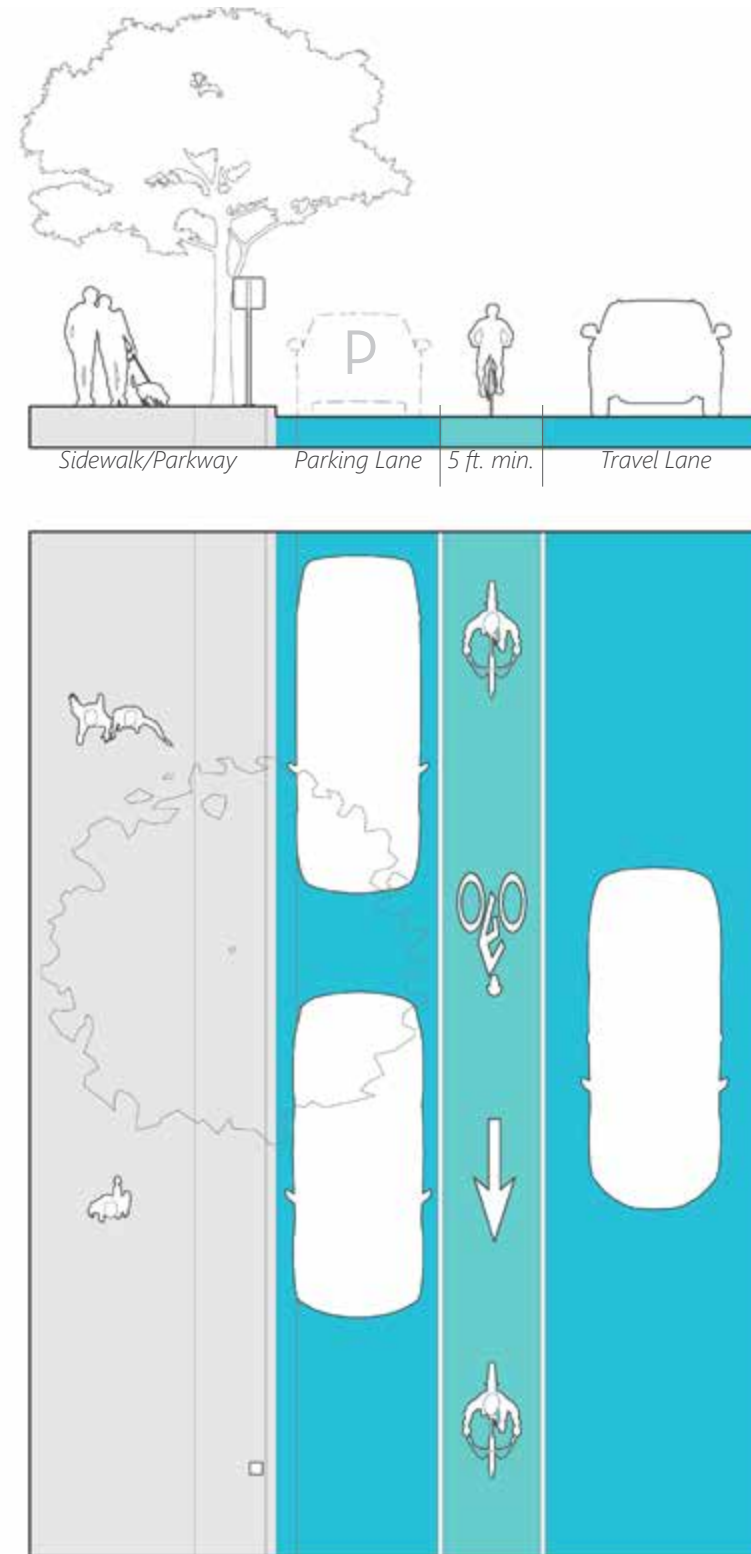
Typical Class II Bikeway, Non-Buffered, On-Street Parking Adjacent.
